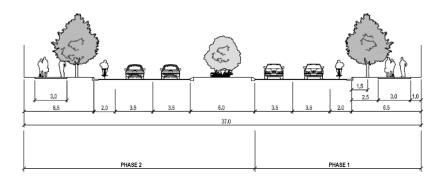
F Sub-arterial Road Type B with kerb and channel
